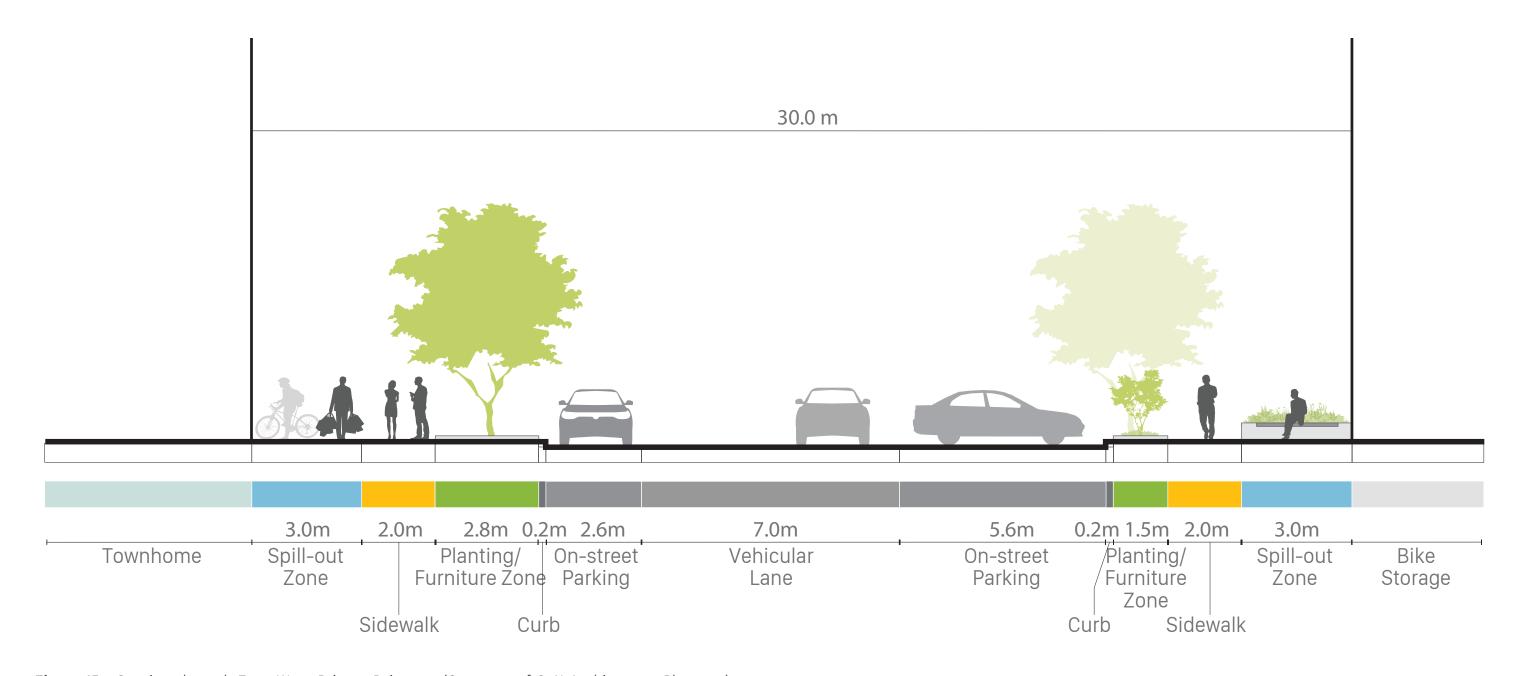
Section through East-West Private Driveway (Courtesy of SvN Architects + Planners)
